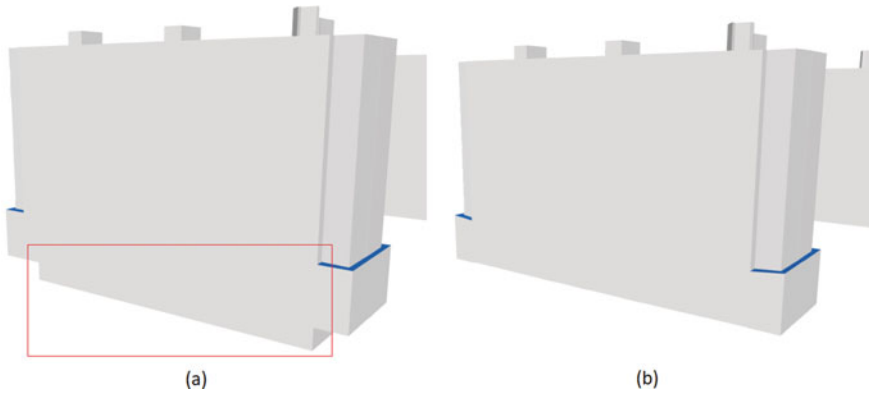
Ground-floor elevation correction: (a) original model (b) corrected model
